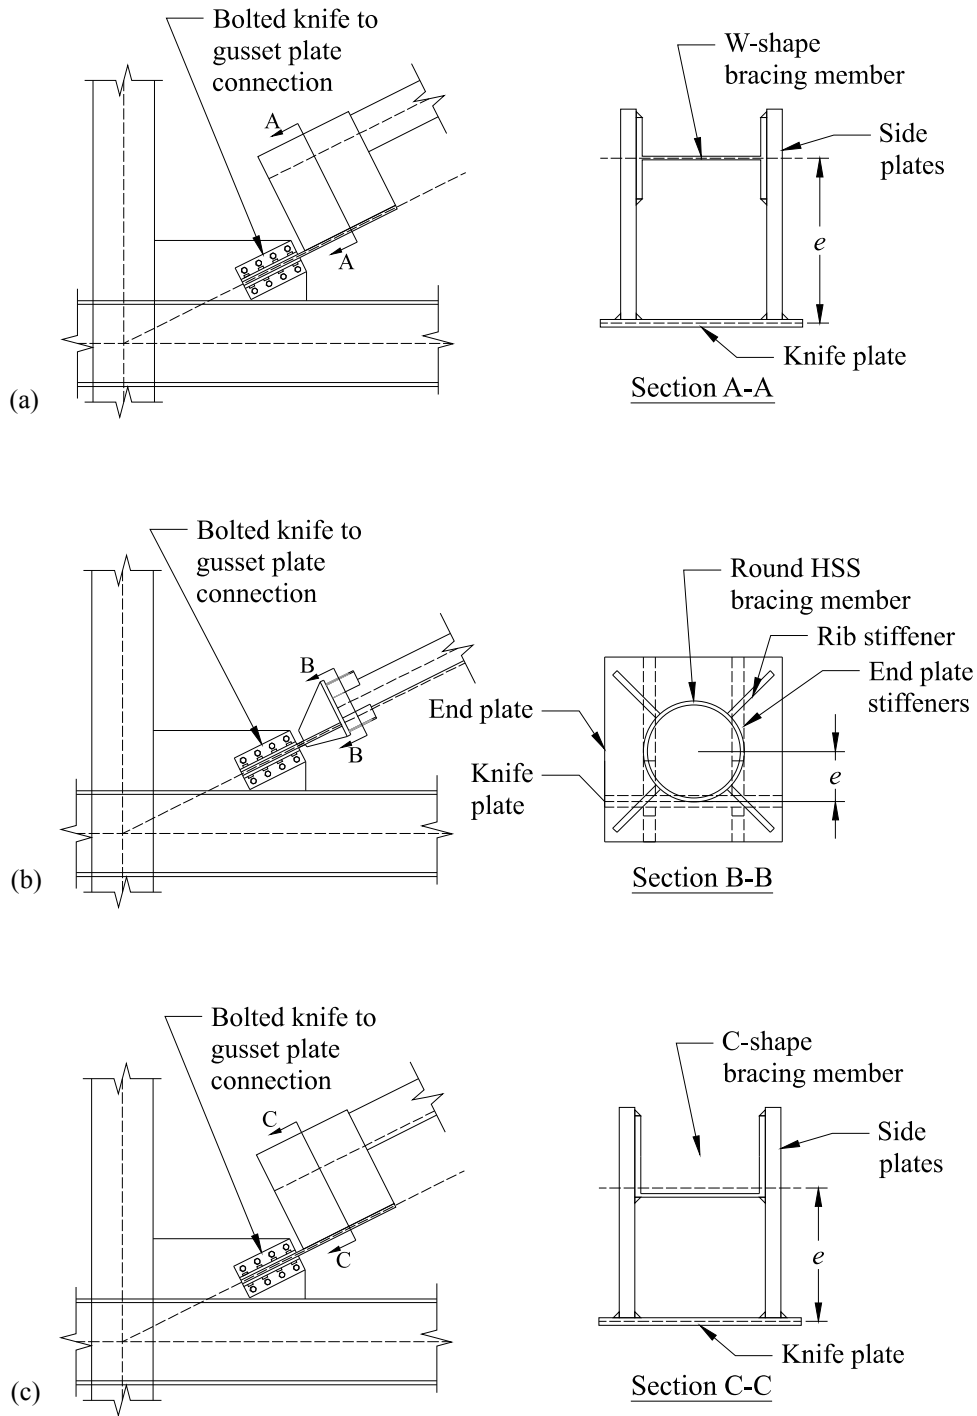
Typical configurations of eccentric assemblies considered in design: (a) W-shape BIEs, (b) round HSS BIEs, and (c) C-shape BIEs.
